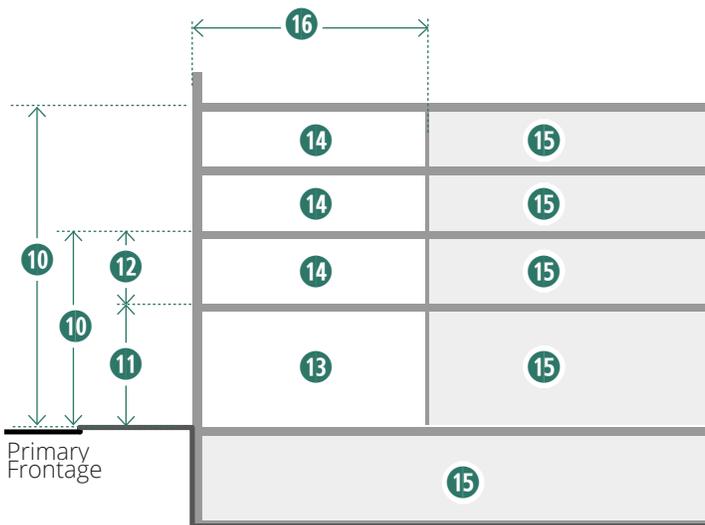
Storefront Building Section: Height & Use Requirements
